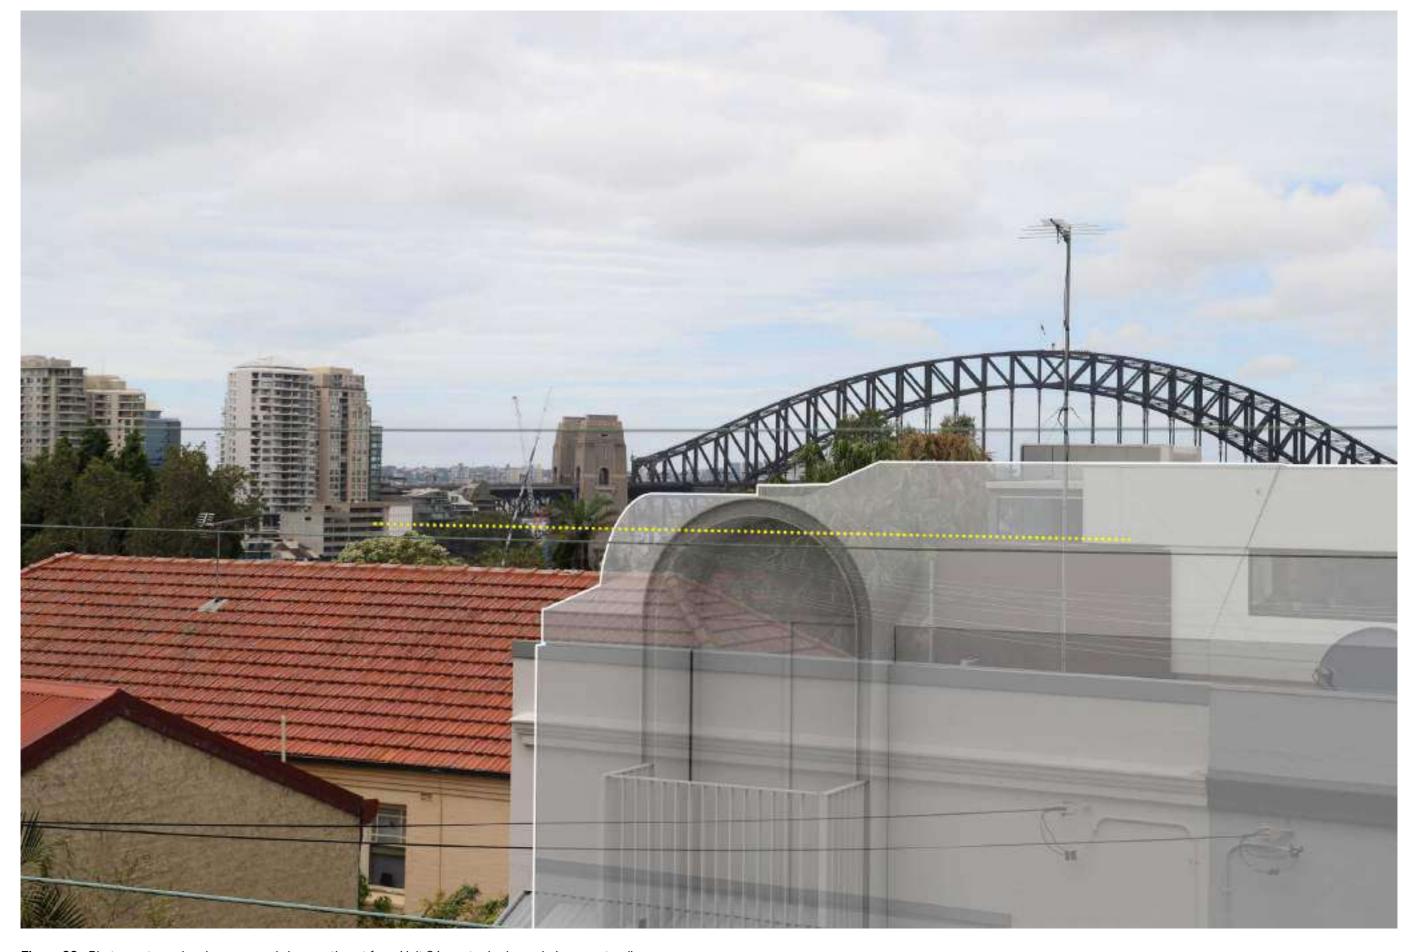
Photomontage showing proposed view southeast from Unit 64 master bedroom balcony – standing
